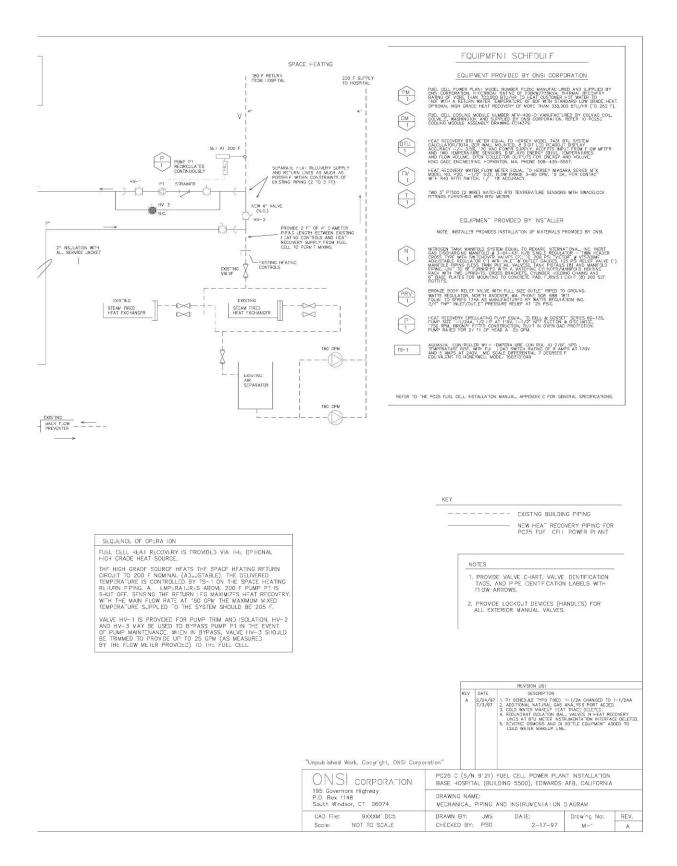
Final installation drawings – mechanical piping and instrumentation diagram.
